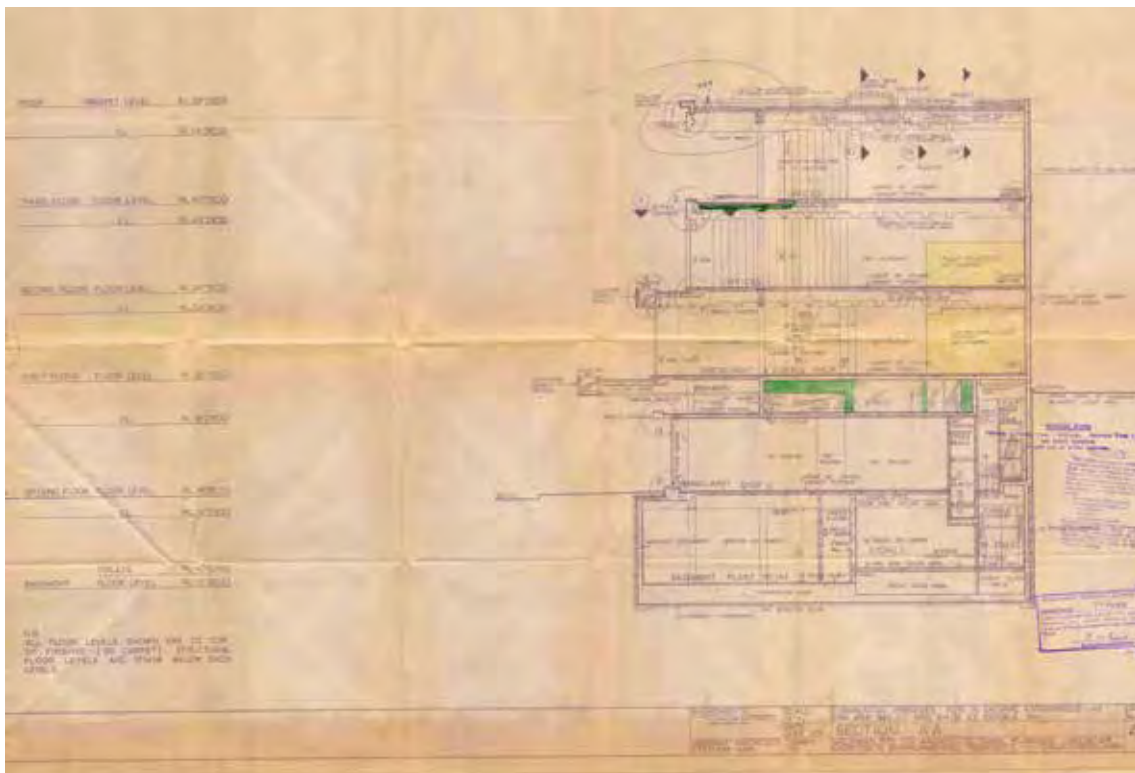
| *Section AA of the Gruzman design. The third floor roof overhang was deleted. The moulded ceilings and the basement were also deleted. (Source: BA 1546/1971)
